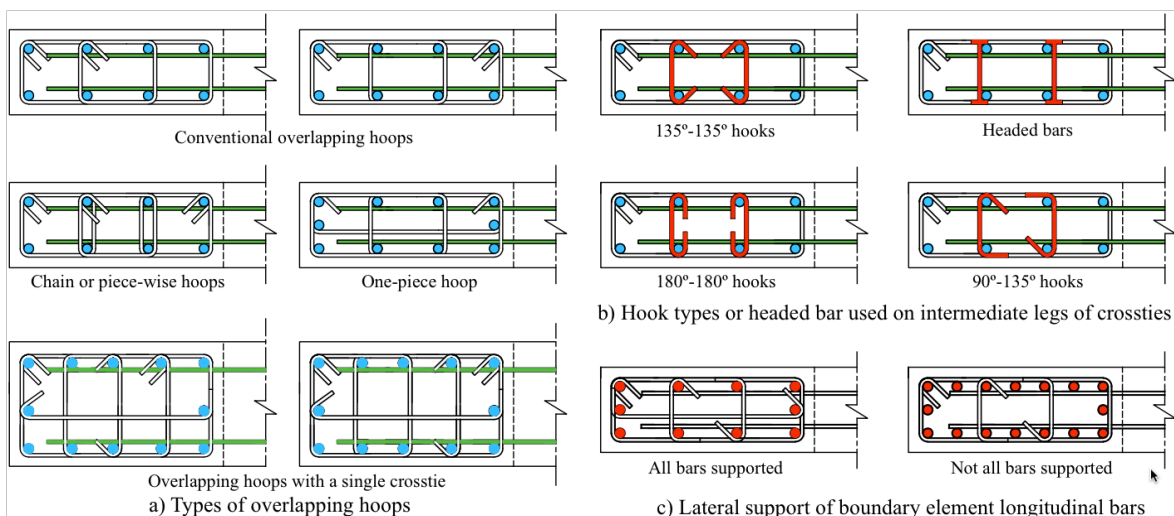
Examples of wall boundary element details parameterized in UCLA-RCWalls.
